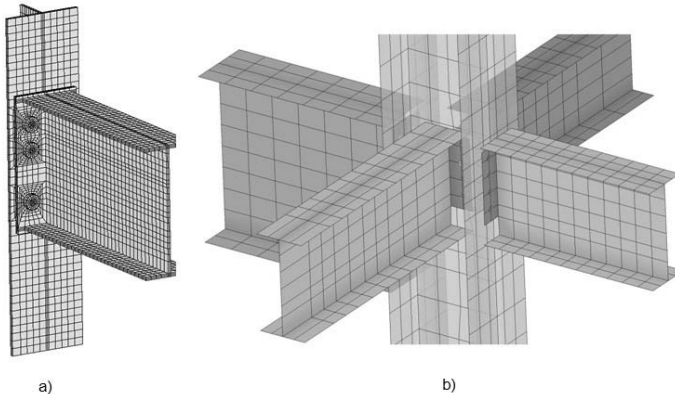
Modeling concepts for frame structure: a) 3D model built of solid elements, b) 3D model built of shell elements.
